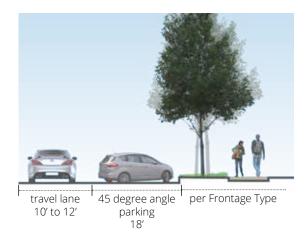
Connector Street Section Alternative Option with Angled Parking
